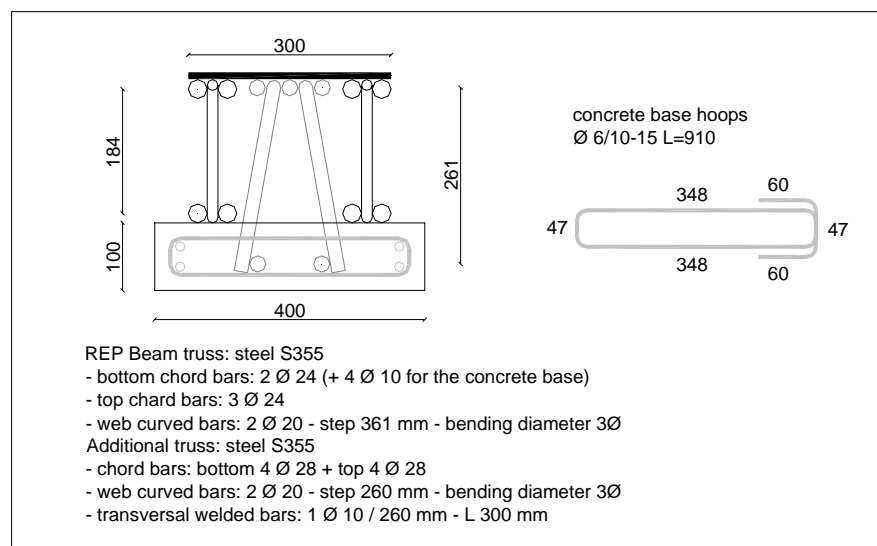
CSTC beam section with concrete base and integrative truss
